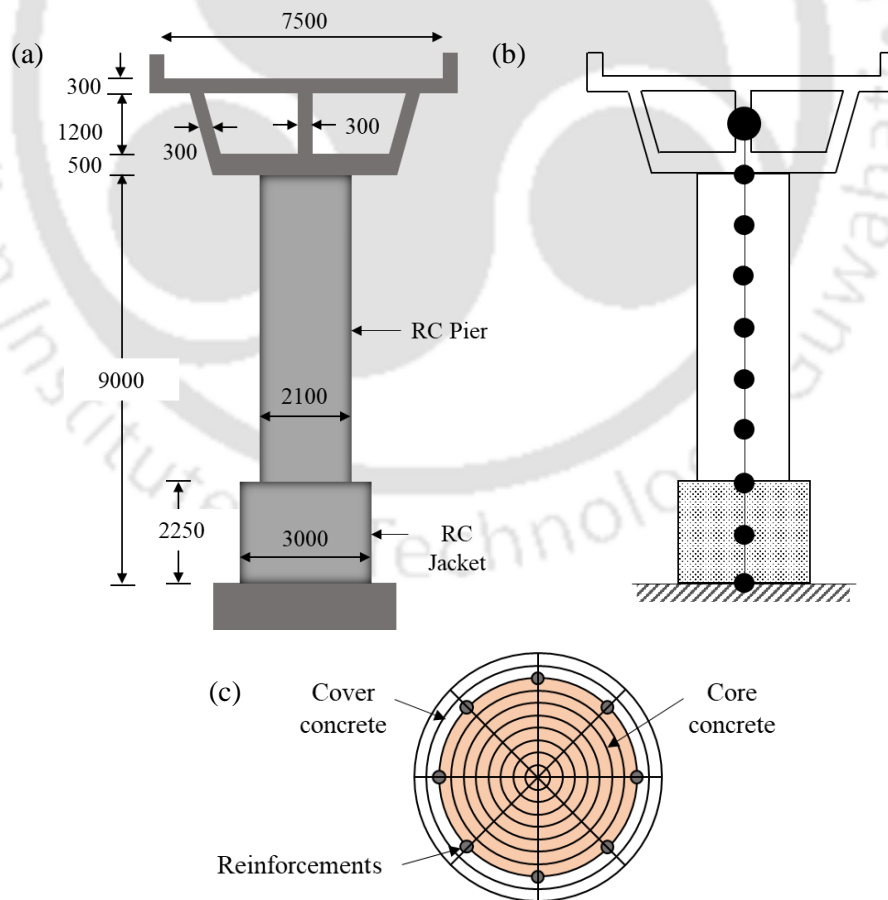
(a) Prototype bridge pier (b) FE Model (c) Pier fibre section
